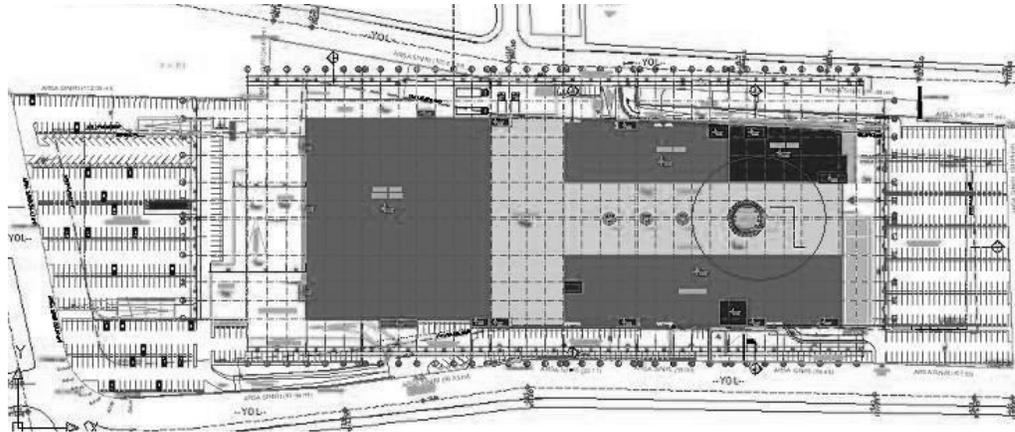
The site plan of CEPA Shopping Center and Bauhaus Store.
